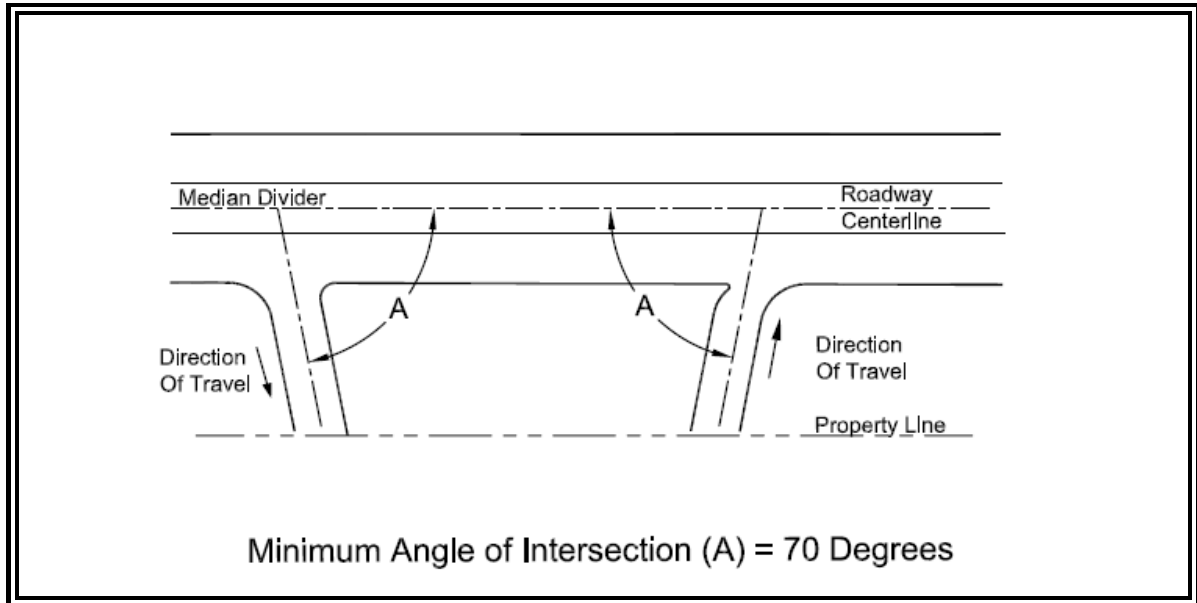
2 MINIMUM ANGLE OF INTERSECTION FOR ONE-WAY DRIVEWAYS
